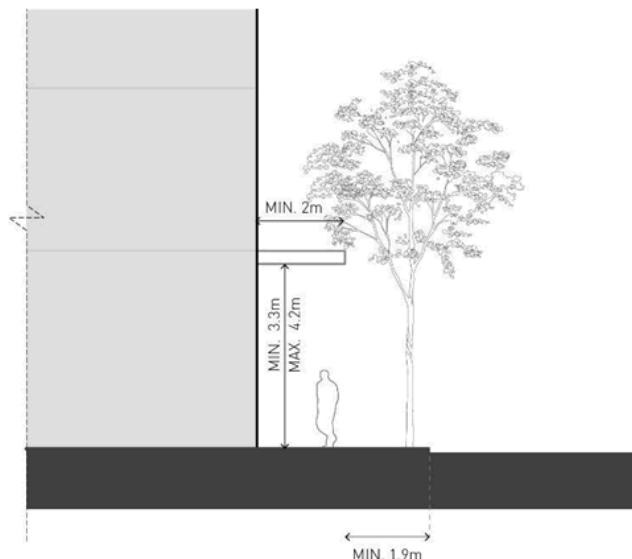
Typical Awning Condition with Street Trees
